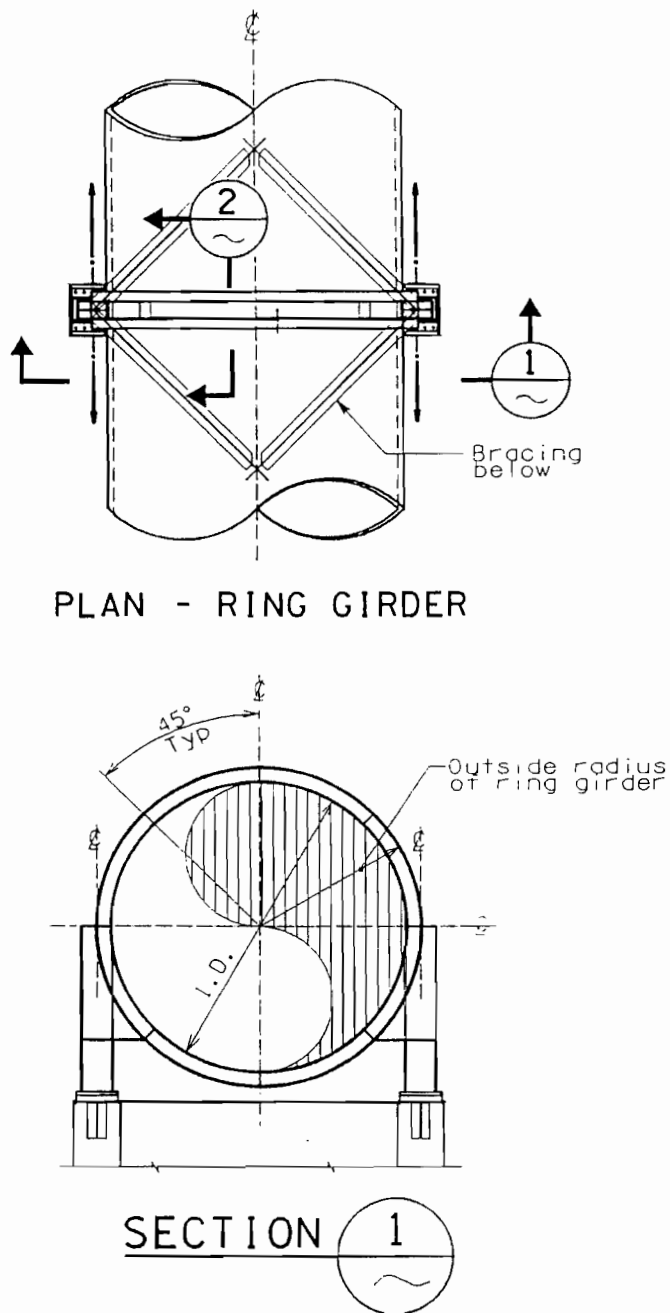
Typical Ring Girder Supporting a Large-Diameter Penstock
